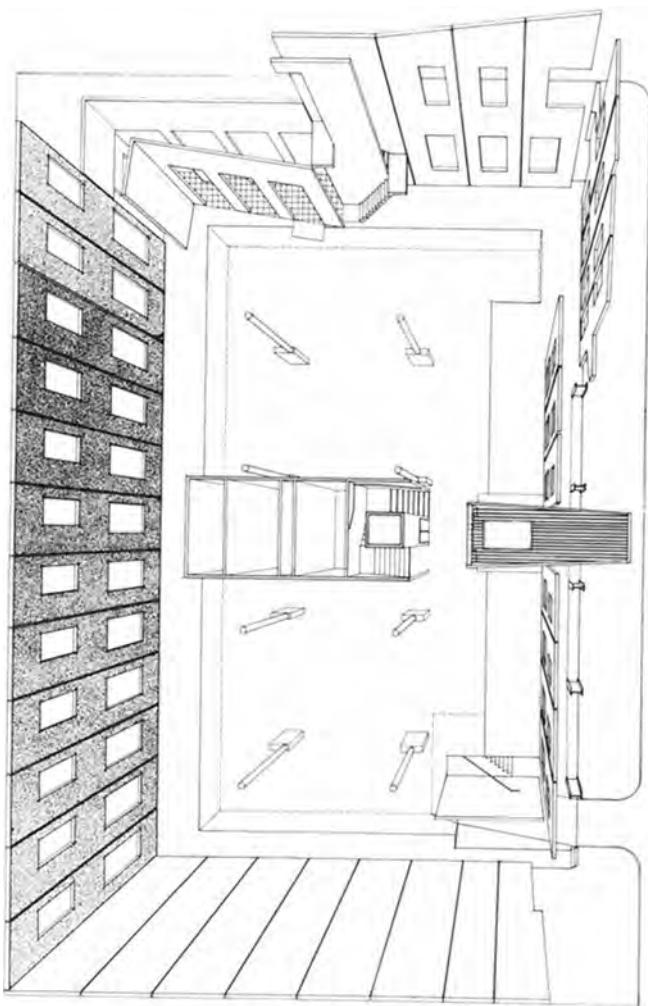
A 1994 plan of the ground floor, as if looking down from an elevated perspective
